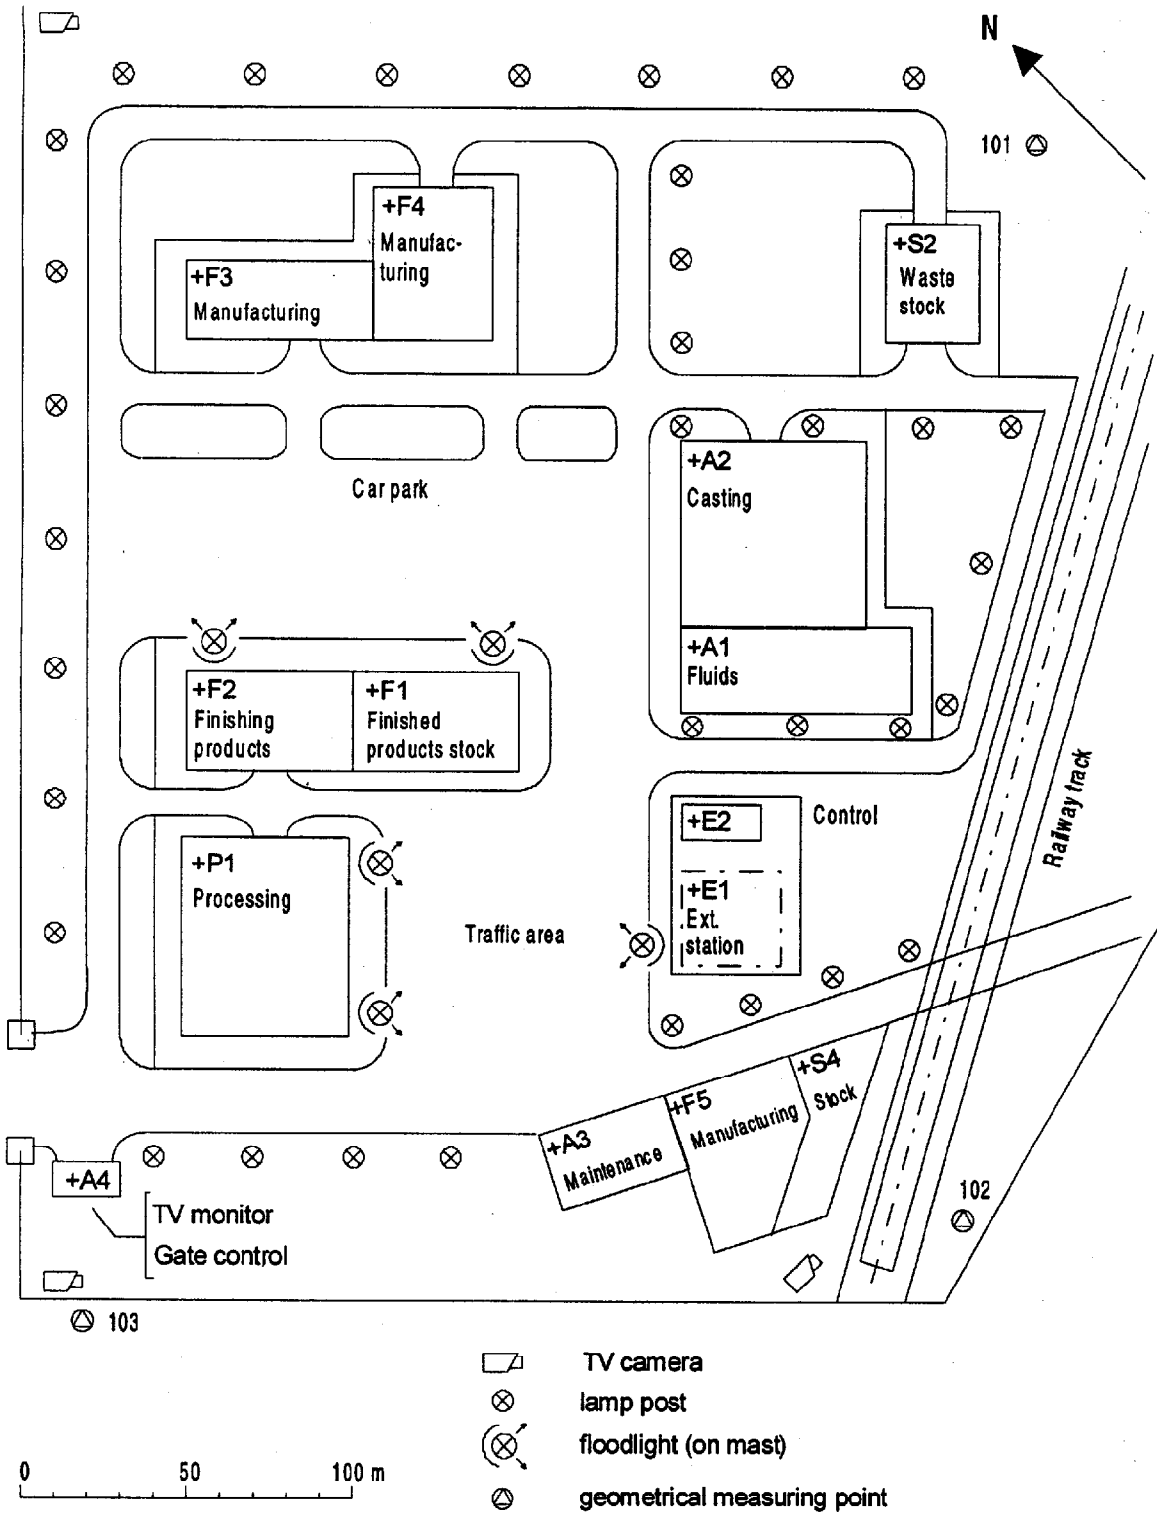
Example of a site arrangement drawing: an industrial plant (see 5.2.1)
